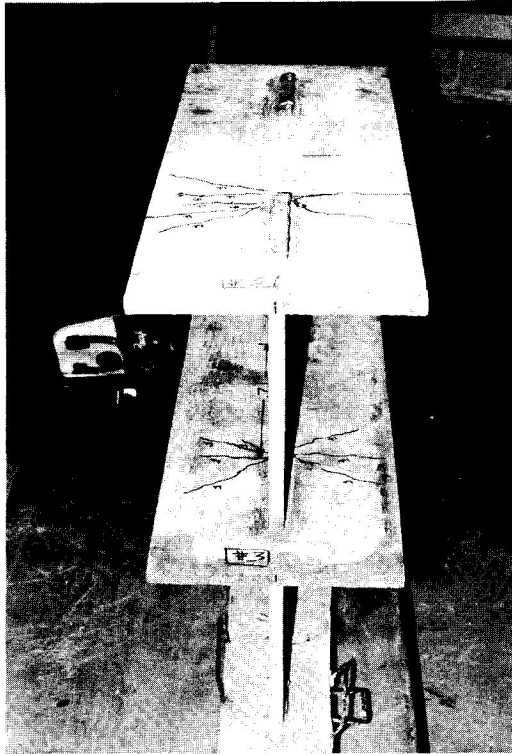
TYPICAL TENSION CRACKS IN SLABS AT SLAB WALL JUNCTION (SERIES # 2 MODEL # 4)
